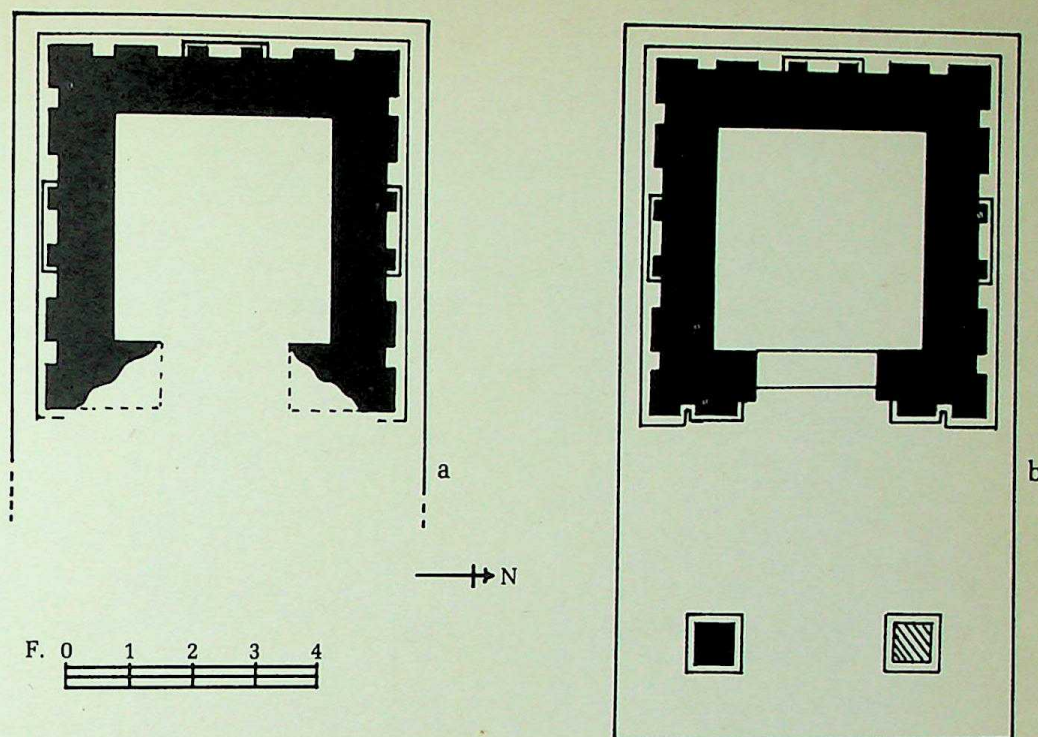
Paṭhārī. Satmaḍhiā group: a. temple no. 1, plan; b. temple no. 2, plan.
